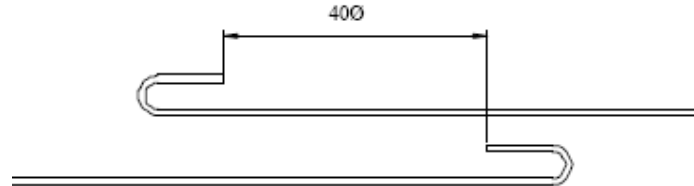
Steel-Retro Benchmark building – overlapping of longitudinal reinforcements
